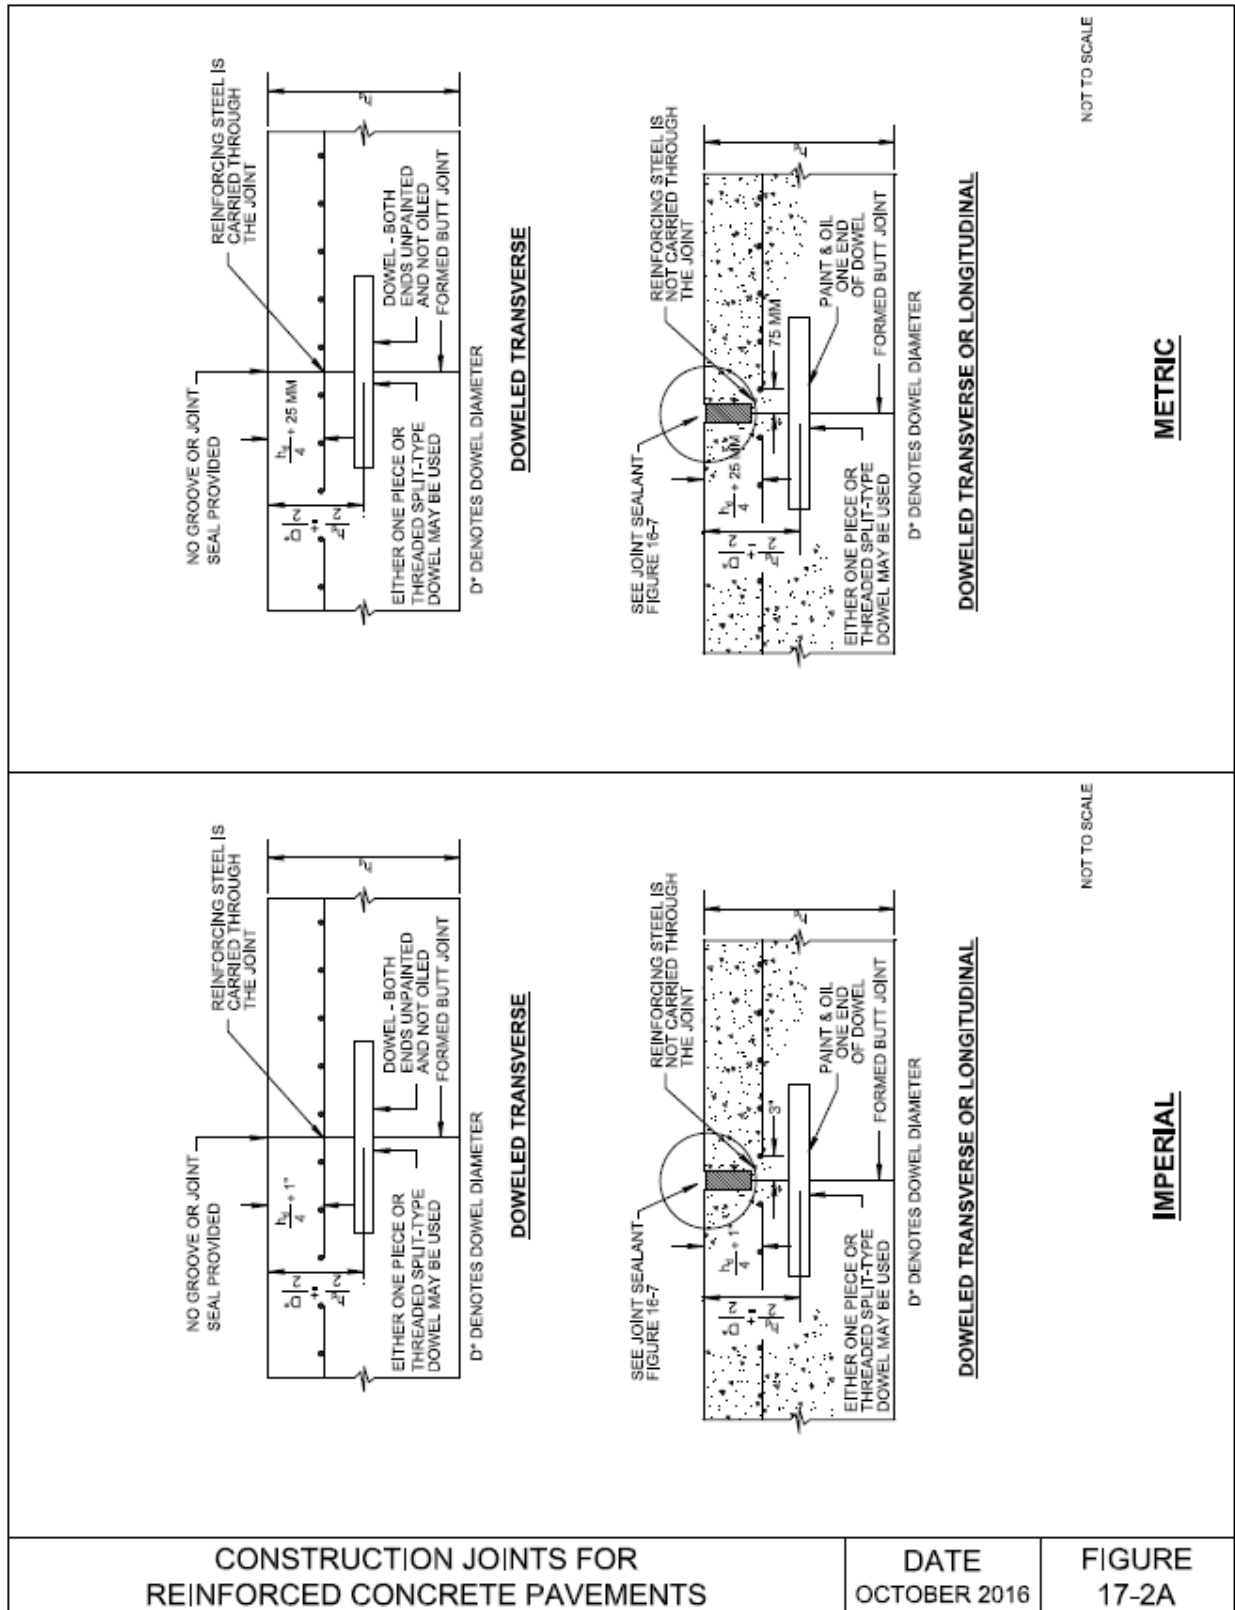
B Construction Joints for Reinforced Concrete Pavements
